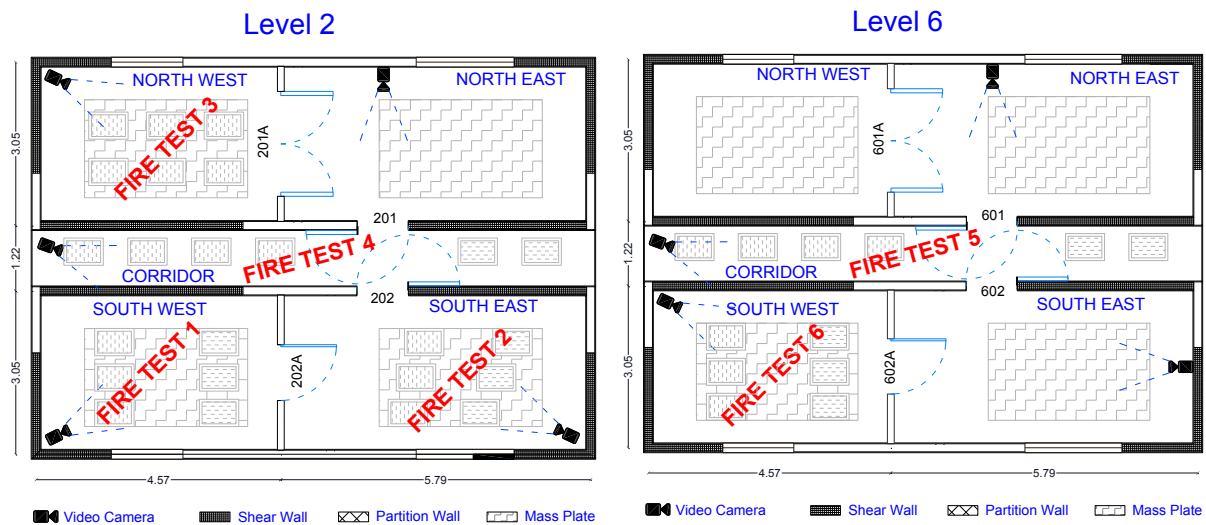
Fire test sequence specified on the building plan layout (level 2 and level 6).
